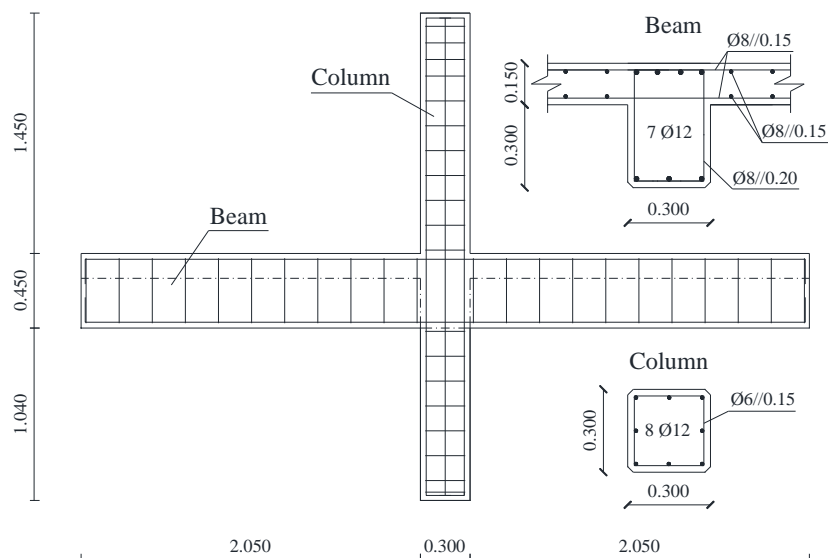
Full-scale beam-column joint specimen reinforcement detailing (in m).
